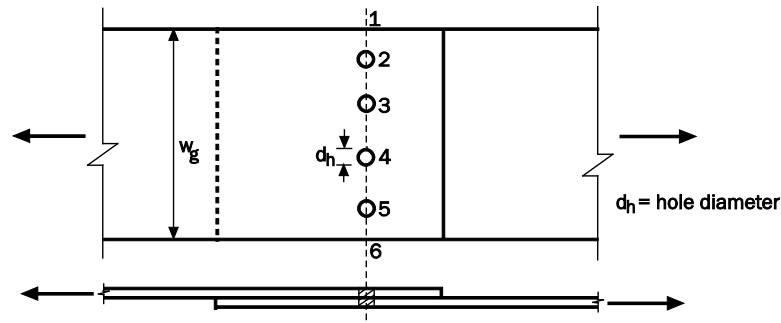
Potential Failure Path of Multiple-Fastener Lap Joint (Tension Rupture)
